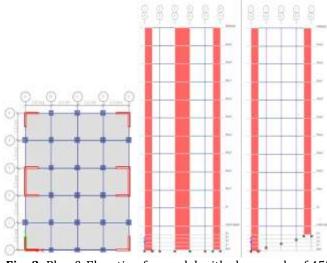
Plan & Elevation for model with slope angle of 45^o with Shear walls at corners and edges.
